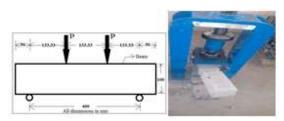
Line diagram of beam. Fig. 14: Testing of beam.
